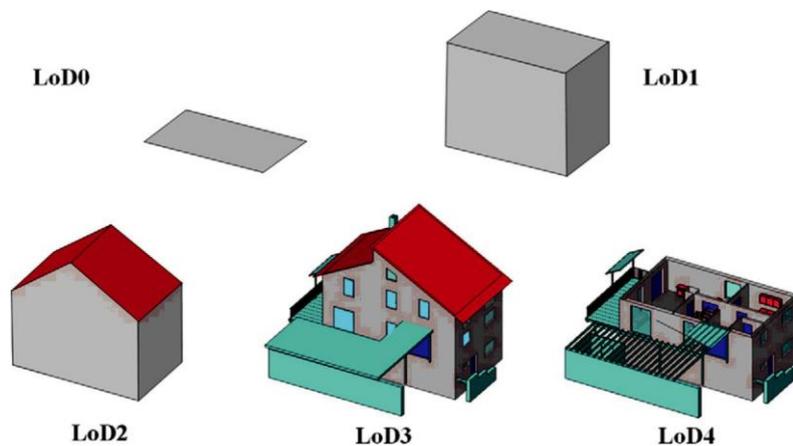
Level of detail for residential buildings (Open Geospatial Consortium, 2006).
